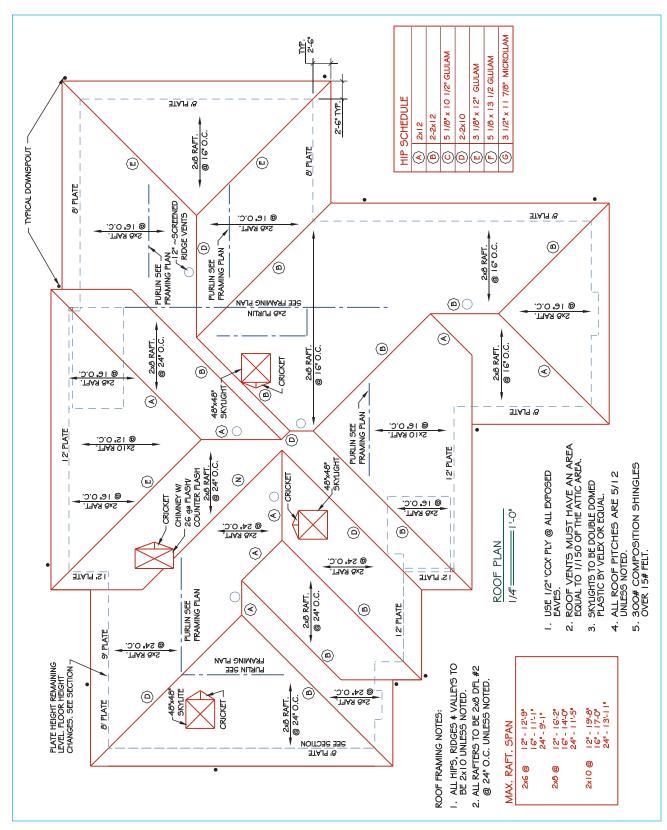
The roof plan shows the shape of the roof structure as well as vents and drains.
